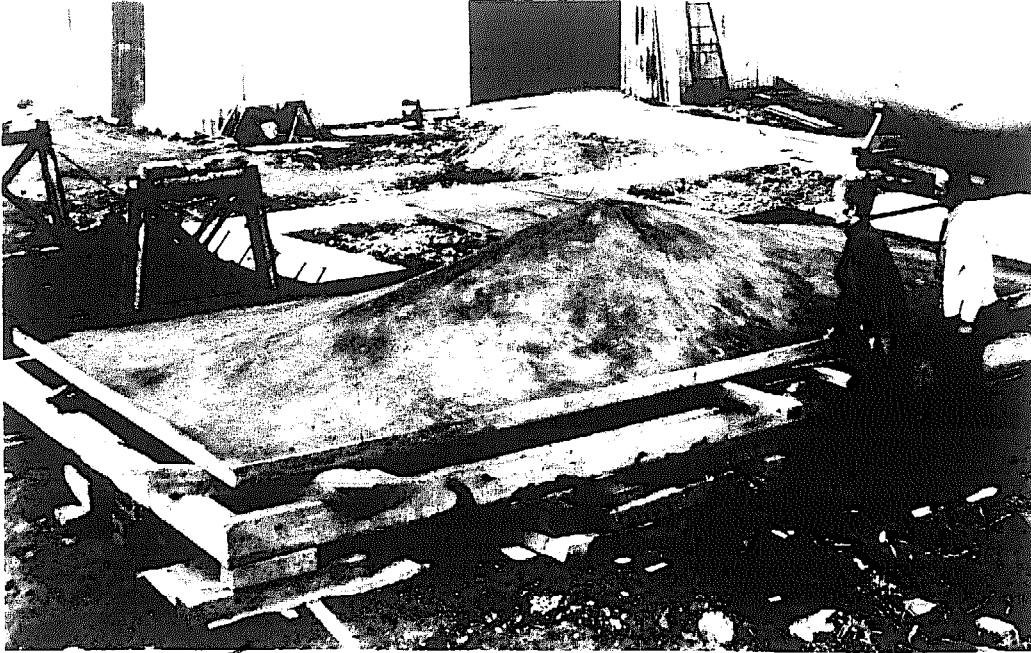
Prefabricated ferrocement roof panel used in Papua New Guinea
